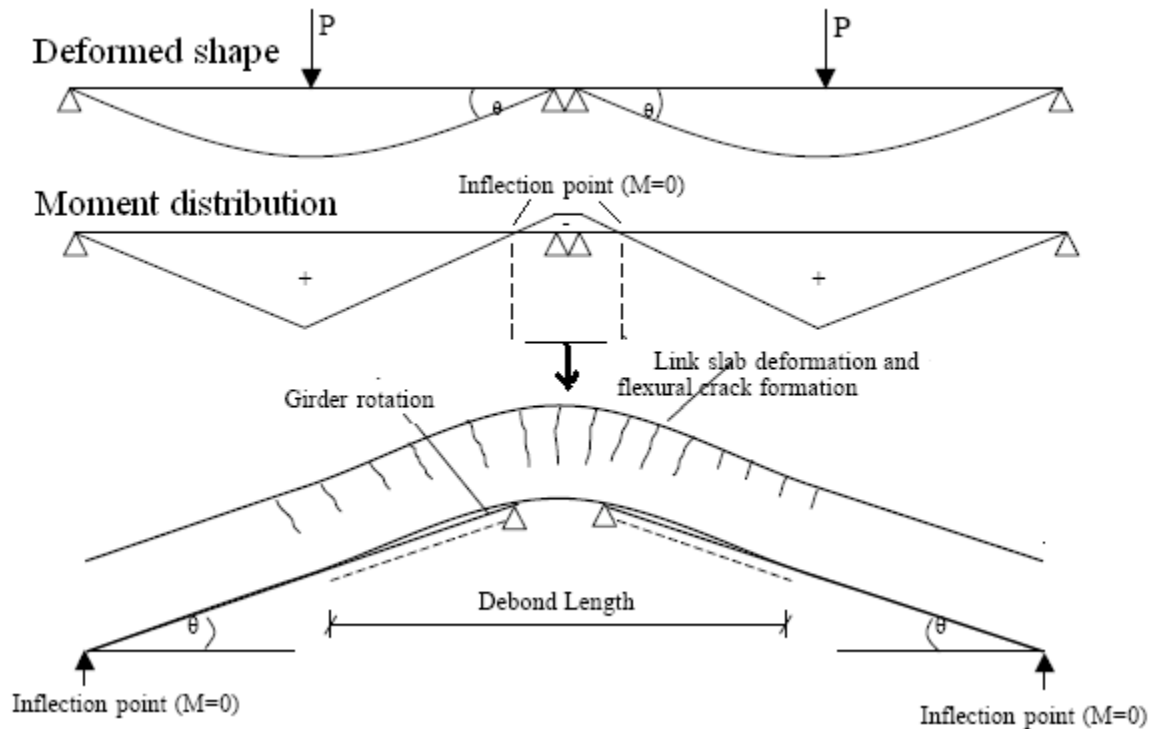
Two span bridge illustrating link slab deformation (between inflection points)
